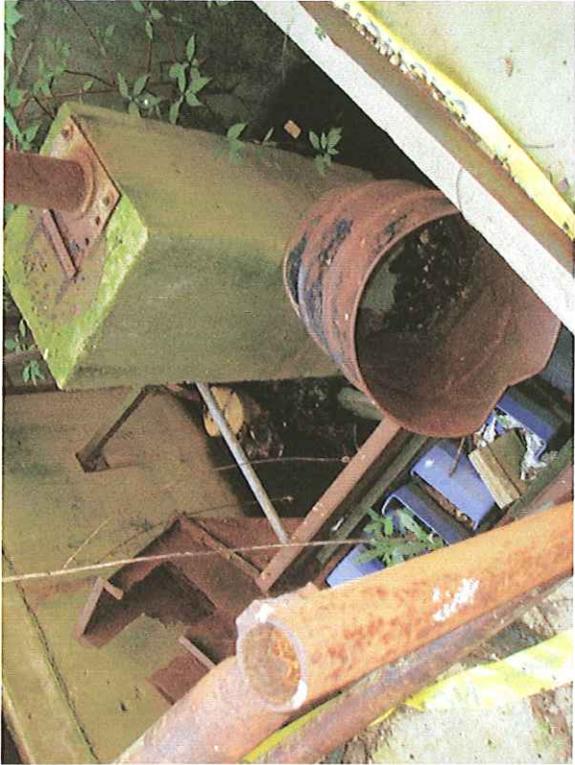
Open pit (south end of conveyor tunnel) in Room 4.
